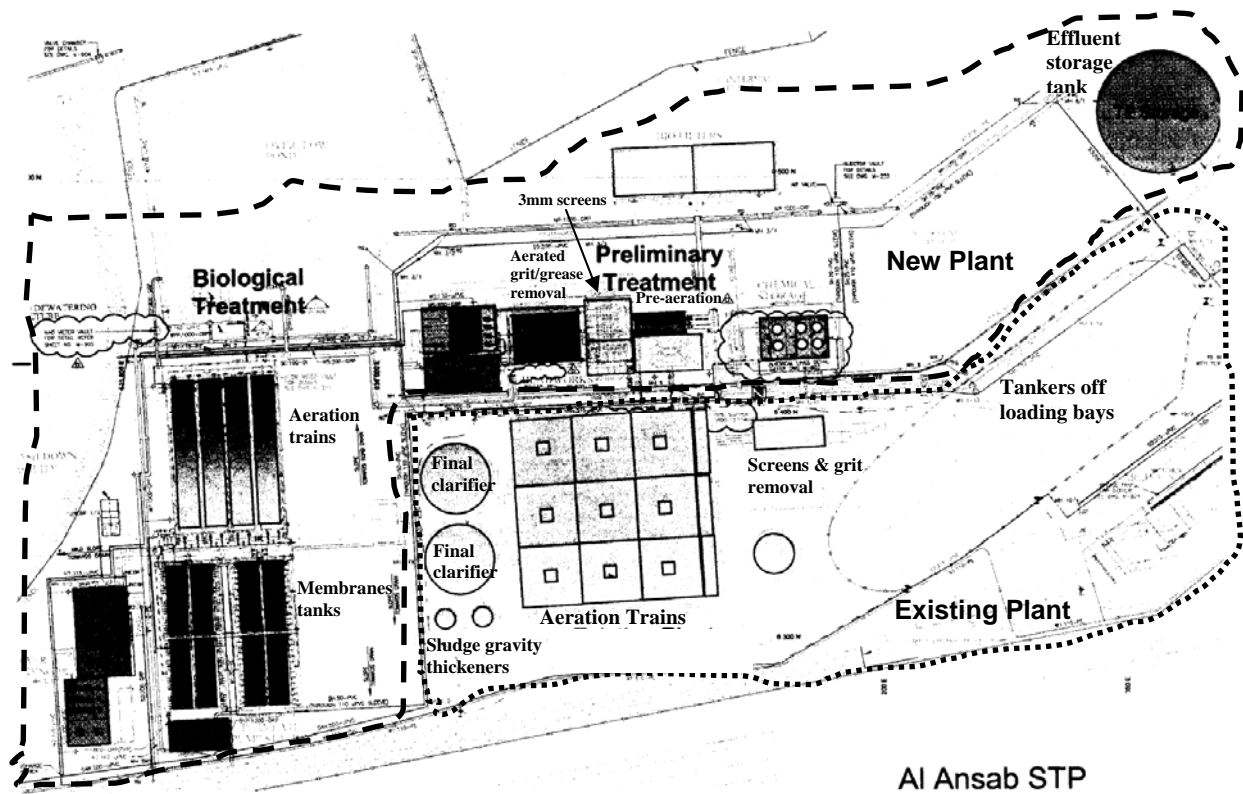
Layout of the new Al Ansab MBR sewage treatment plant
